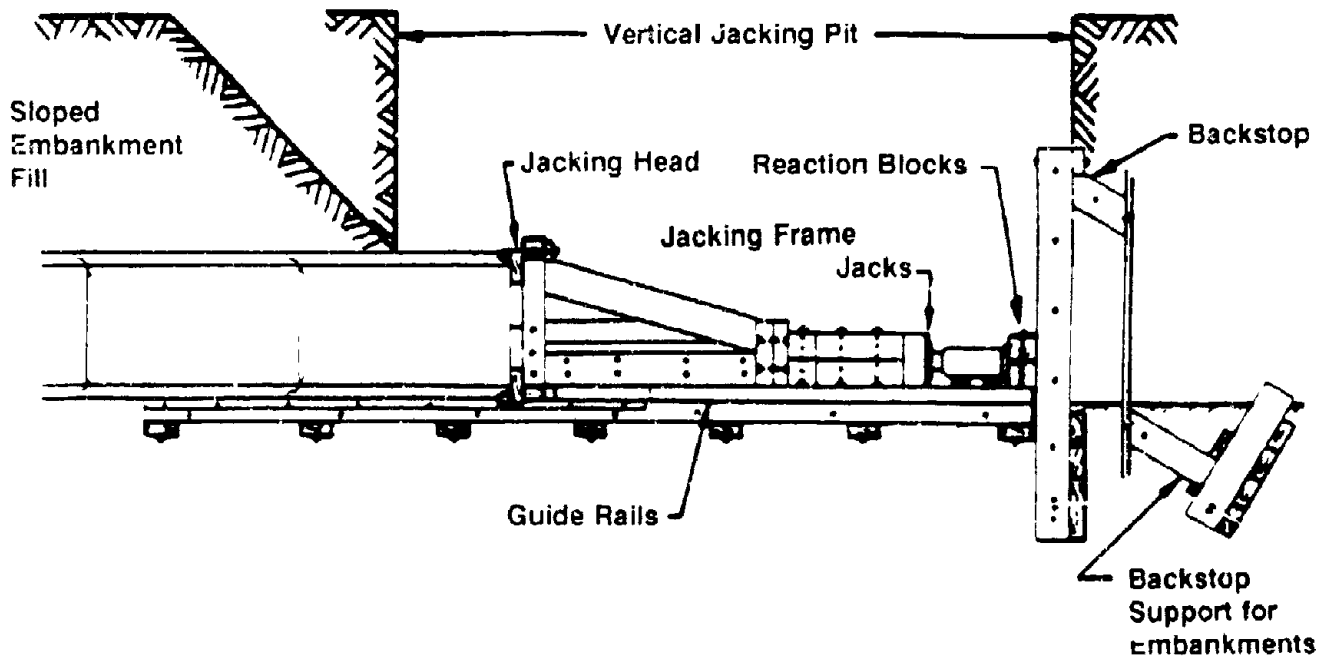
Typical equipment setup for concrete pipe jacking.⁽¹⁾
